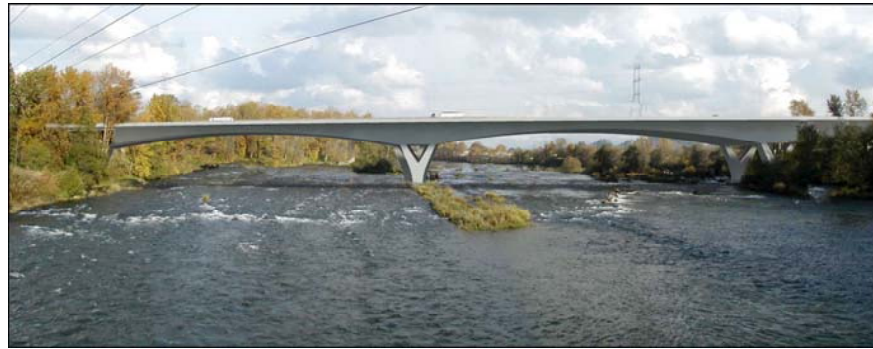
Key View 1 – Existing Conditions and with Build Alternative Design Options (Bridge Type)
